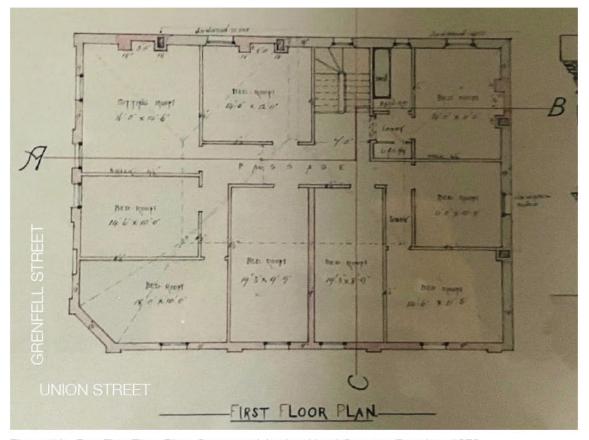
Part First Floor Plan, Crown and Anchor Hotel Contract Drawing, 1879 Source: State Library of South Australia, B 58651
